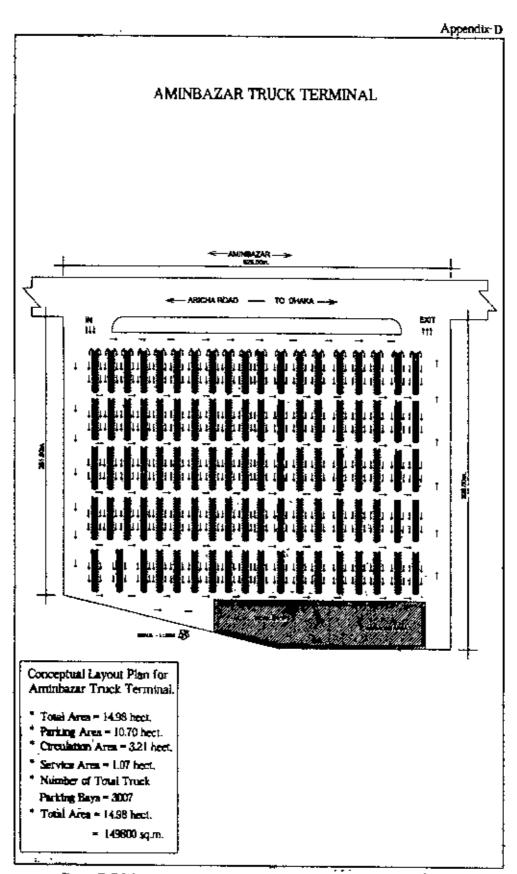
Conceptual Layout Plan for Aminbazar Truck Terminal
